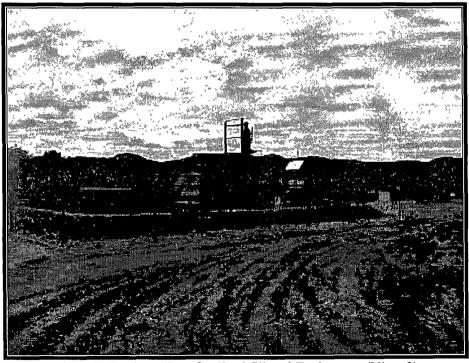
Gardner #7A after Backfill and Tank re-set (View 2)
